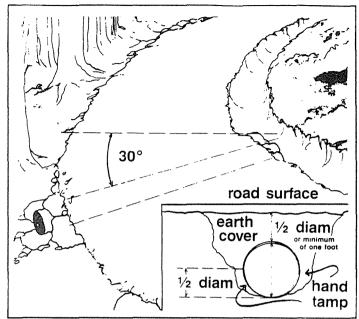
Design and installation of pipe culverts (Vermont Department of Forests, Parks and Recreation, 1987).
